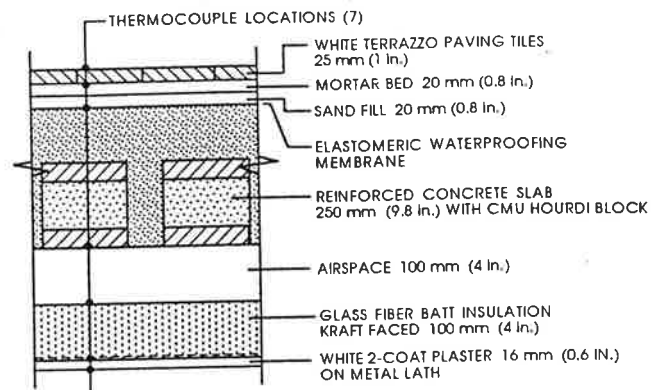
Roof 8: internally insulated (glass fiber) hourdi slab.
